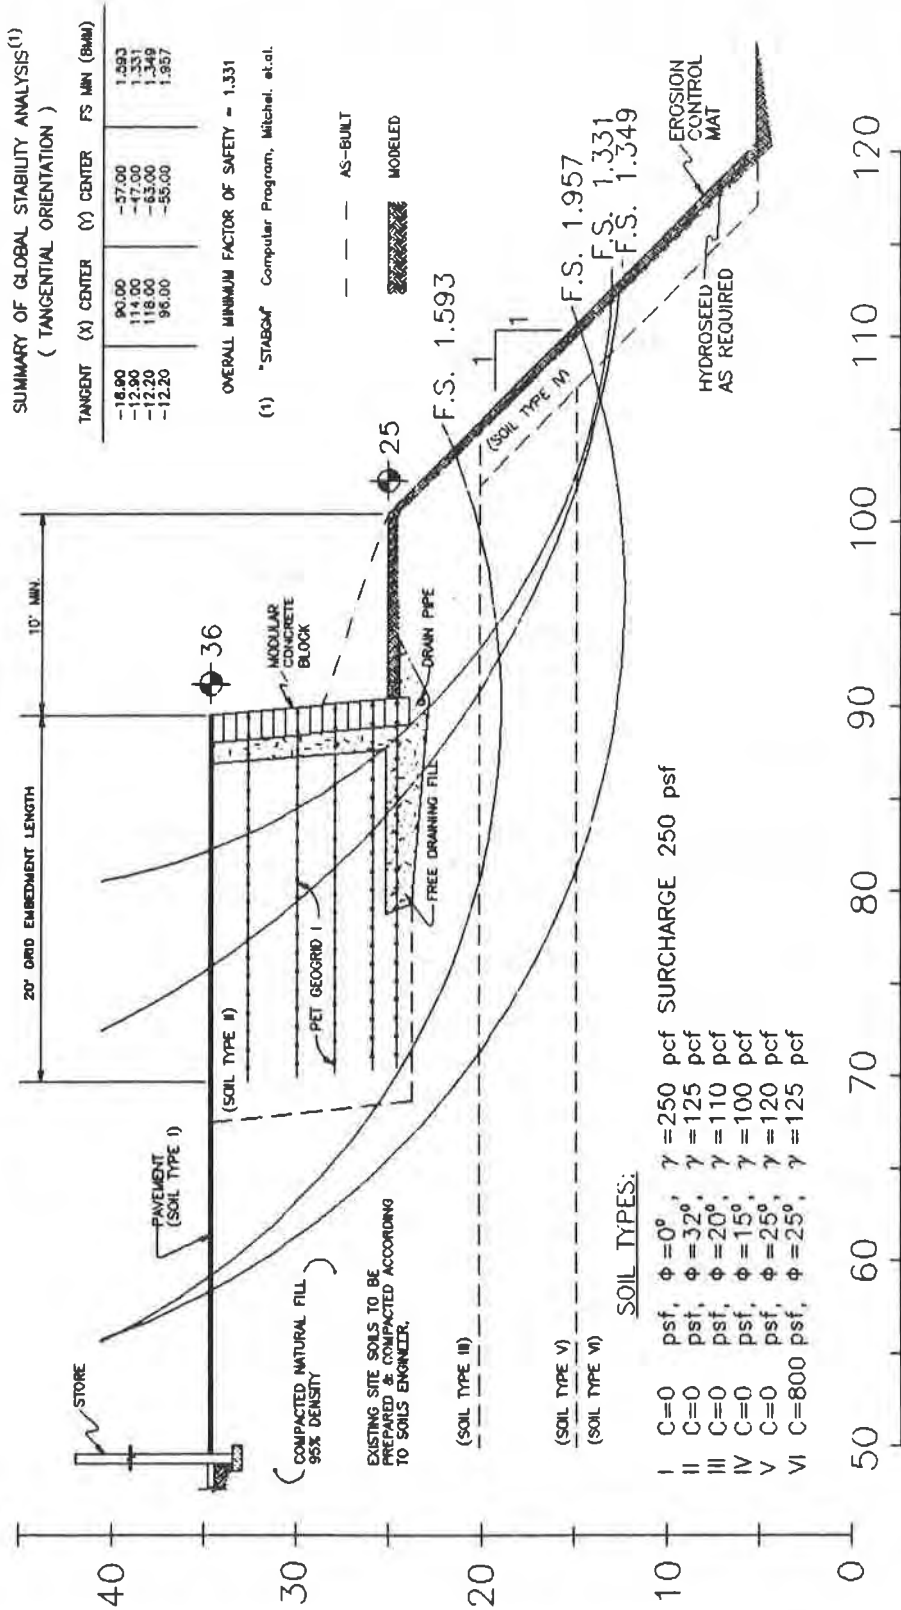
TYPICAL WALL & SLOPE SECTION ATOMIC TIRE CENTER
